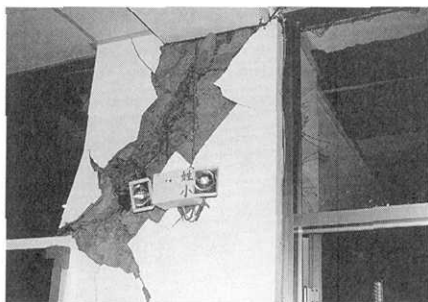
Shear failure of non-structural wall at building B of Kuoshing National Elementary School
